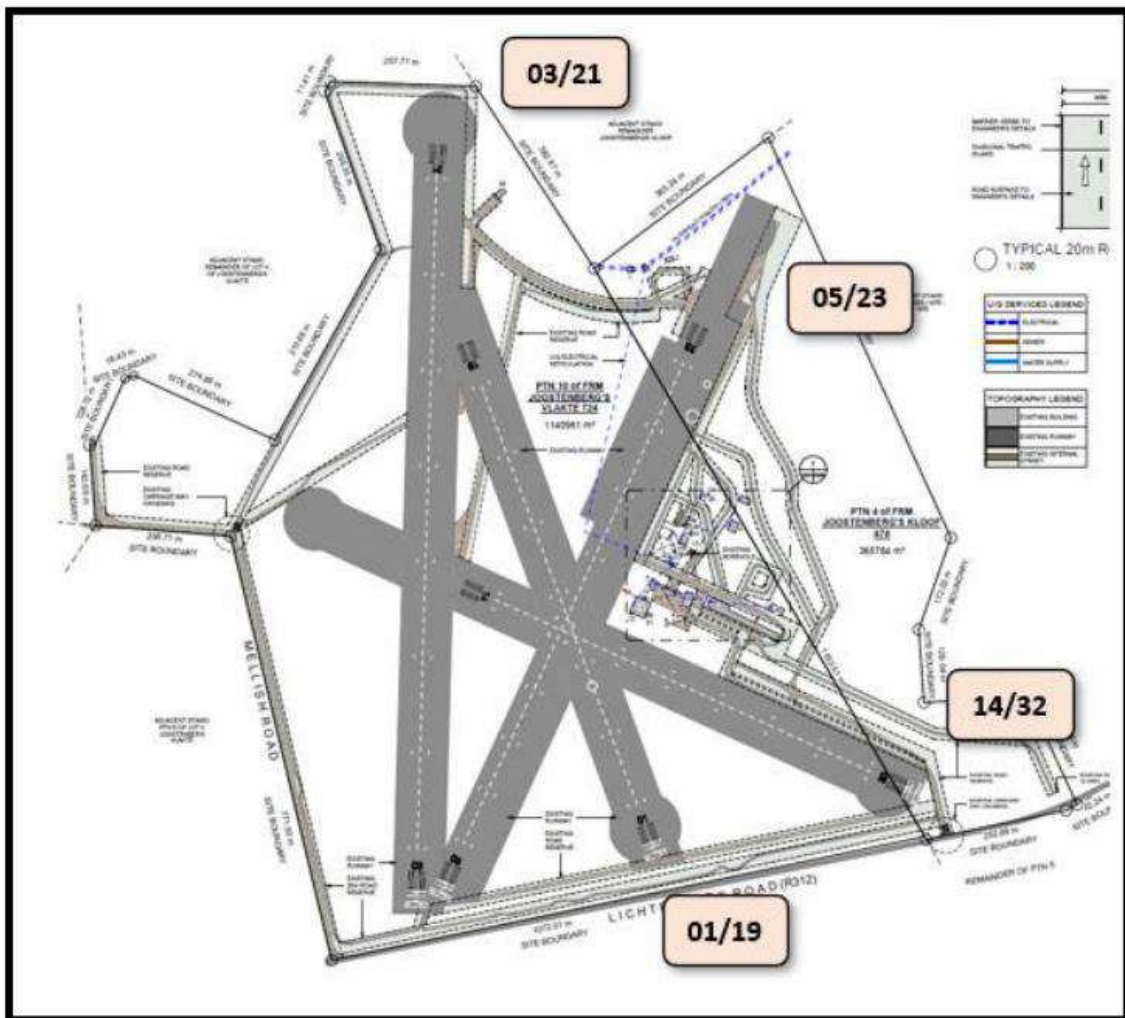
Current site layout indicating the four existing concrete strips (No-go development option)
